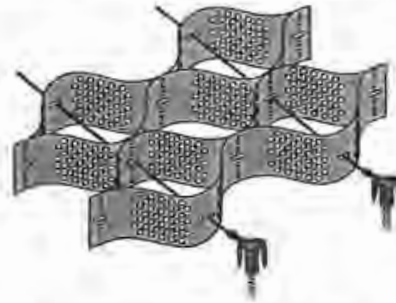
ATRA Anchor for Crest and Toe Anchorage
